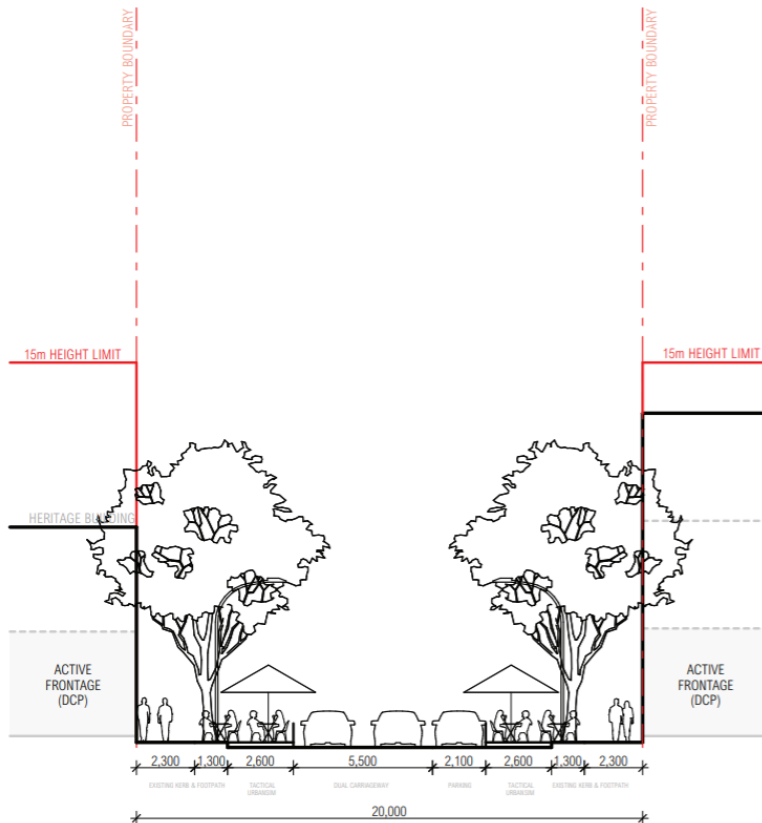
Indicative street section – McCauley Street extension, North Alexandria
